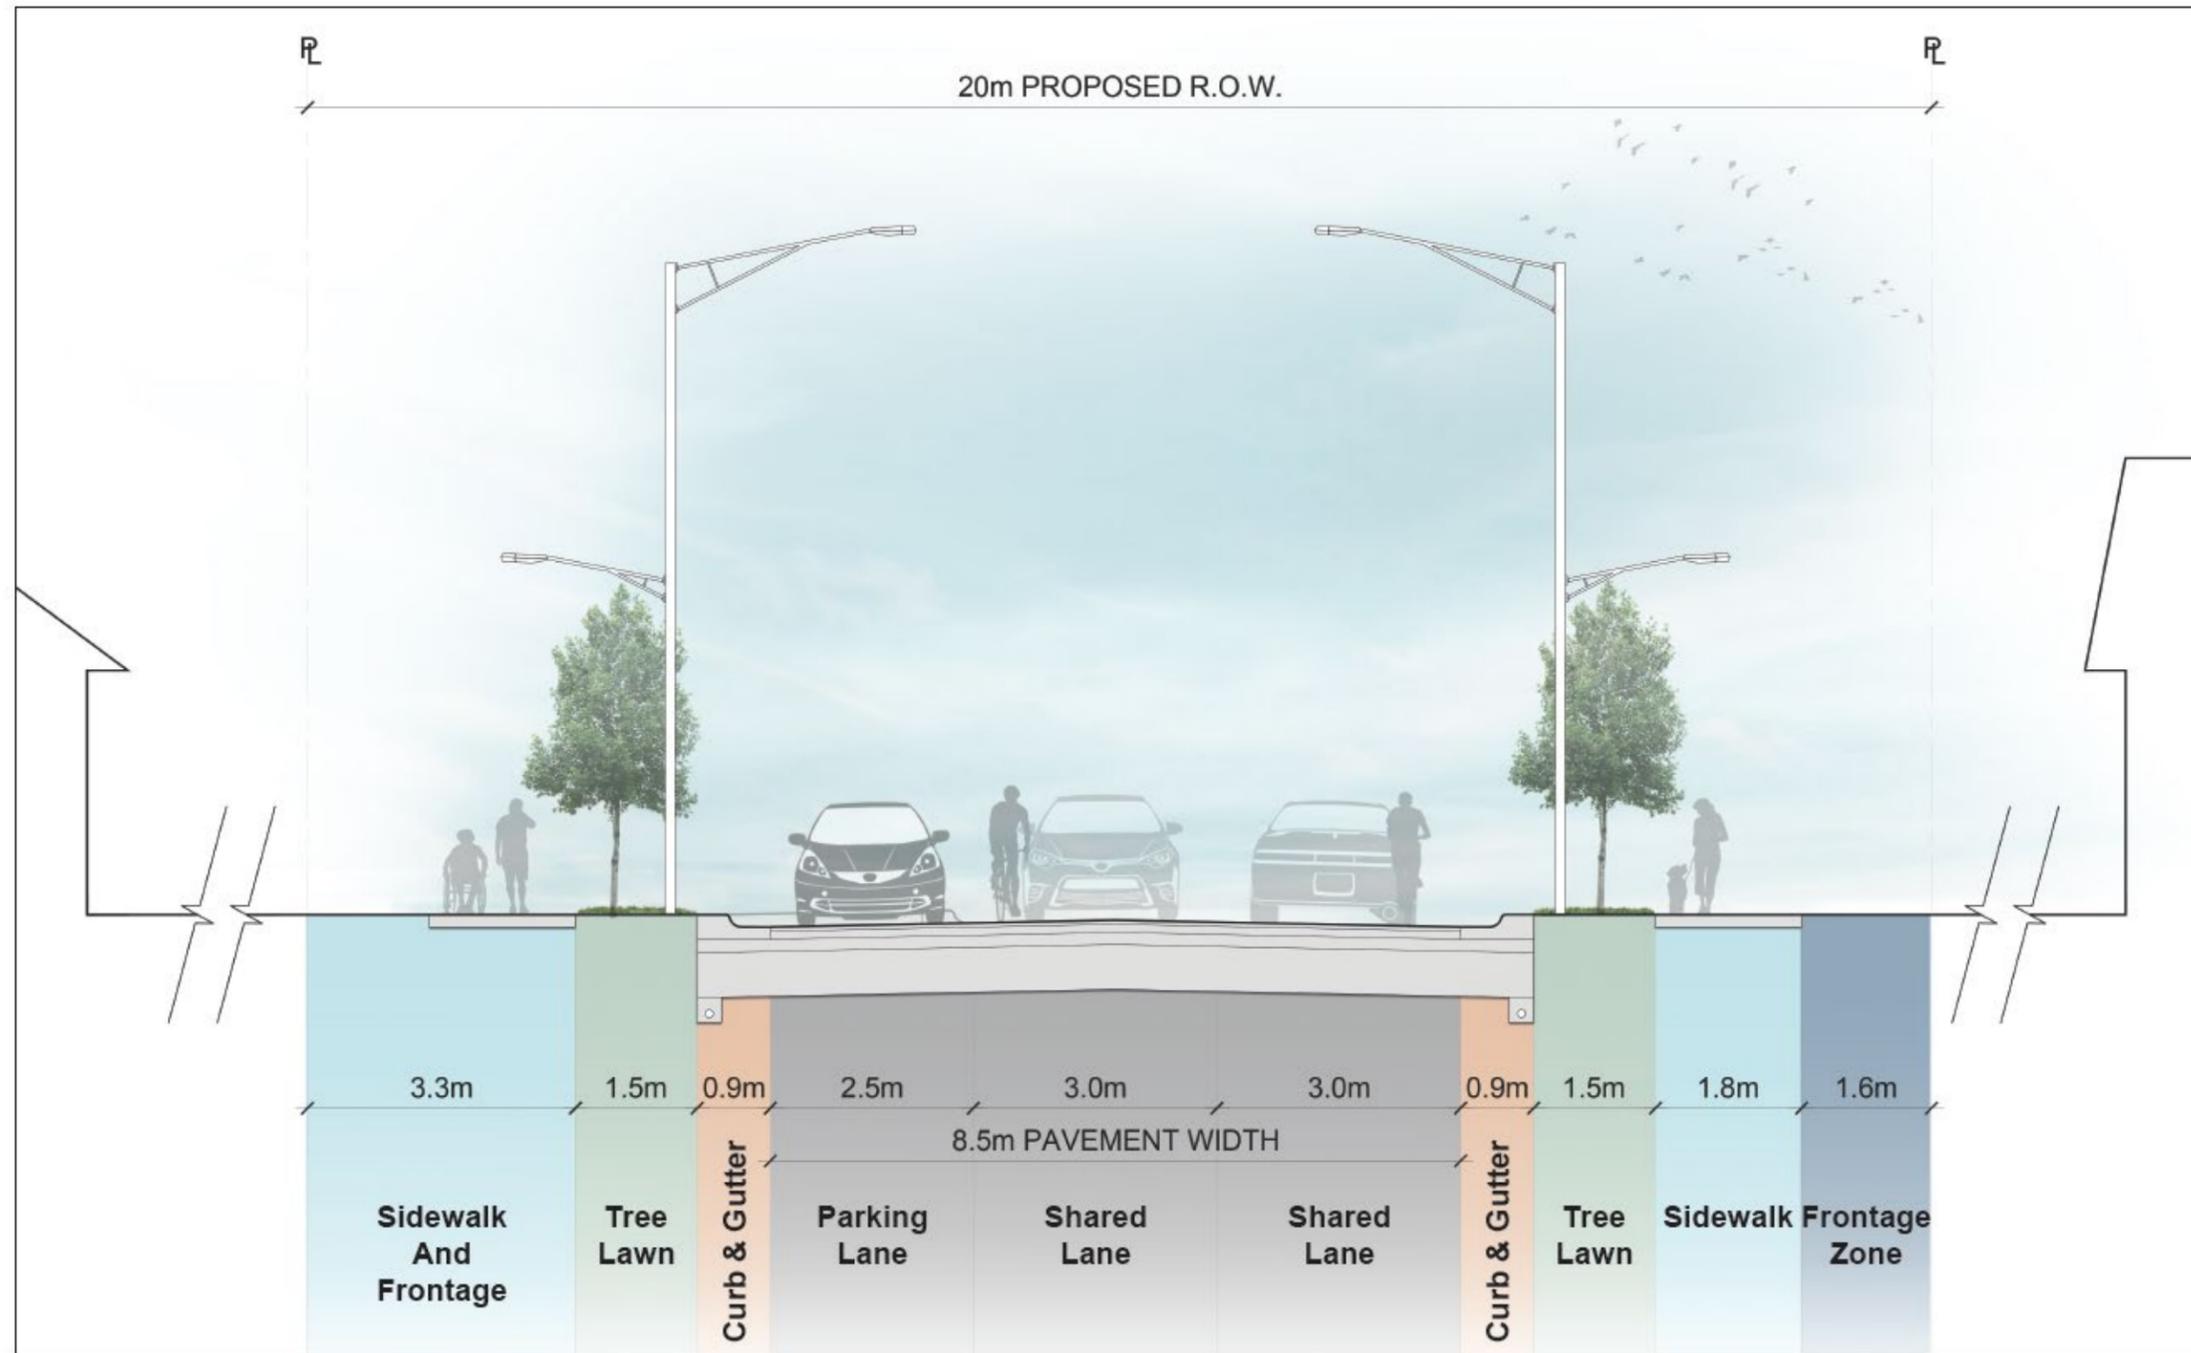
Neighbourhood Residential Street (Rural) – Conceptual Application A (Retrofit)
